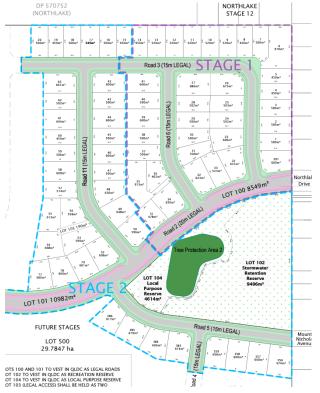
Proposed road layout - Allenby Farms (WFH) RM220913
